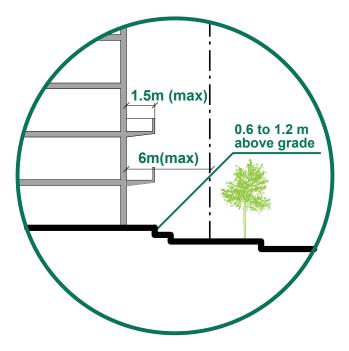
Ground floor conditions on B-Streets. Residential uses are elevated above the ground floor, but directly linked to the public sidewalk through individual points of access serving each unit.
